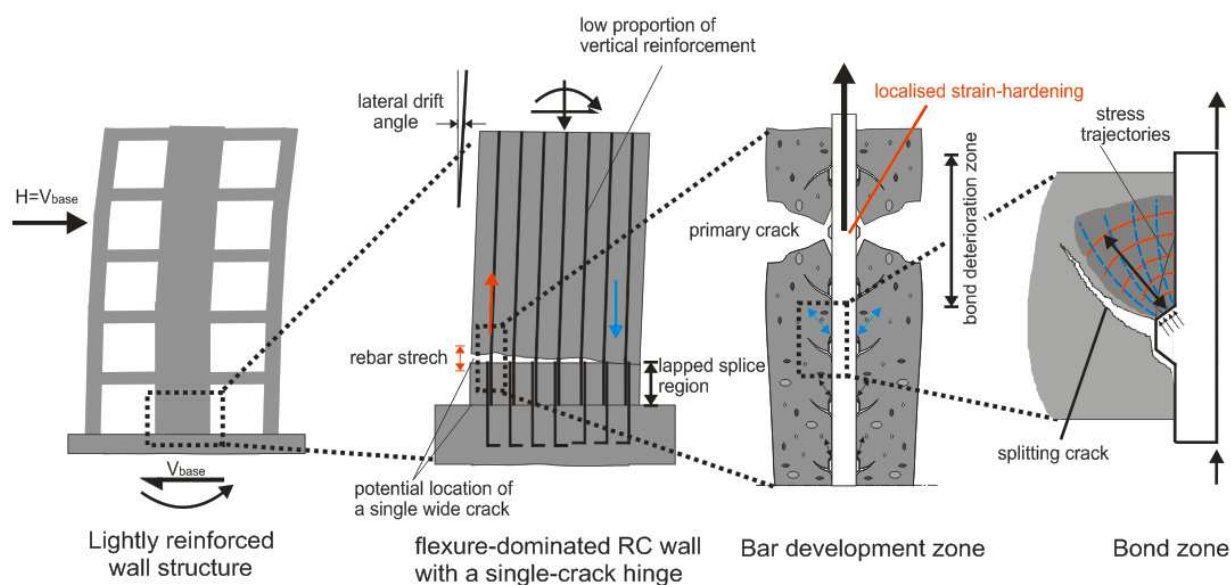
The deterioration of bond resistance in lightly reinforced concrete walls provides the only source of ductility if the wall forms a single crack (or few cracks) at the potential plastic hinge zones.
